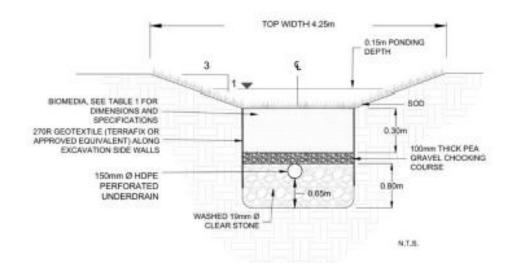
Two Tiered Bioretention Planter Detail (BR1)
